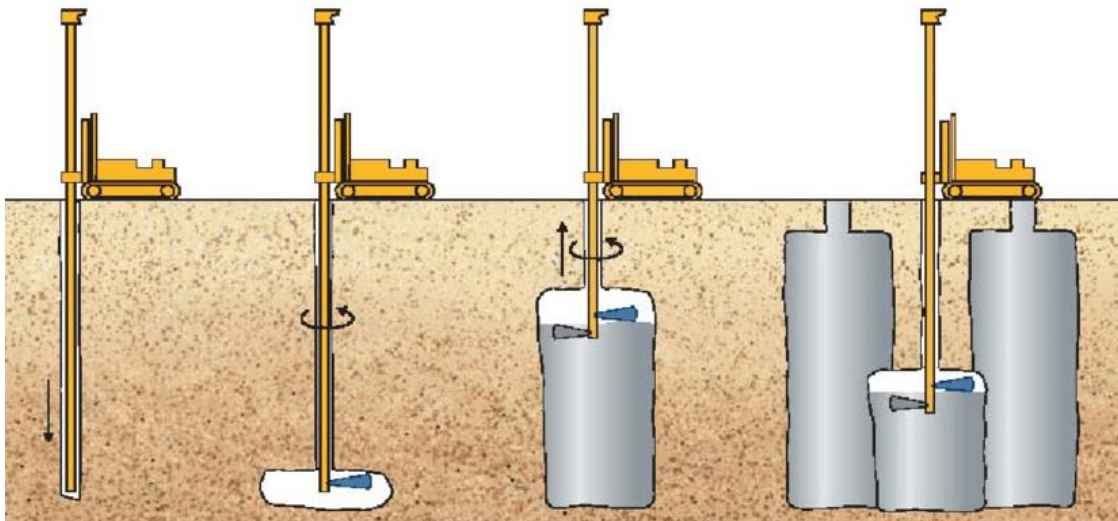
Jet grouting procedure (Source: <https://www.pilebuck.com/foundation/soil-improvement>)
